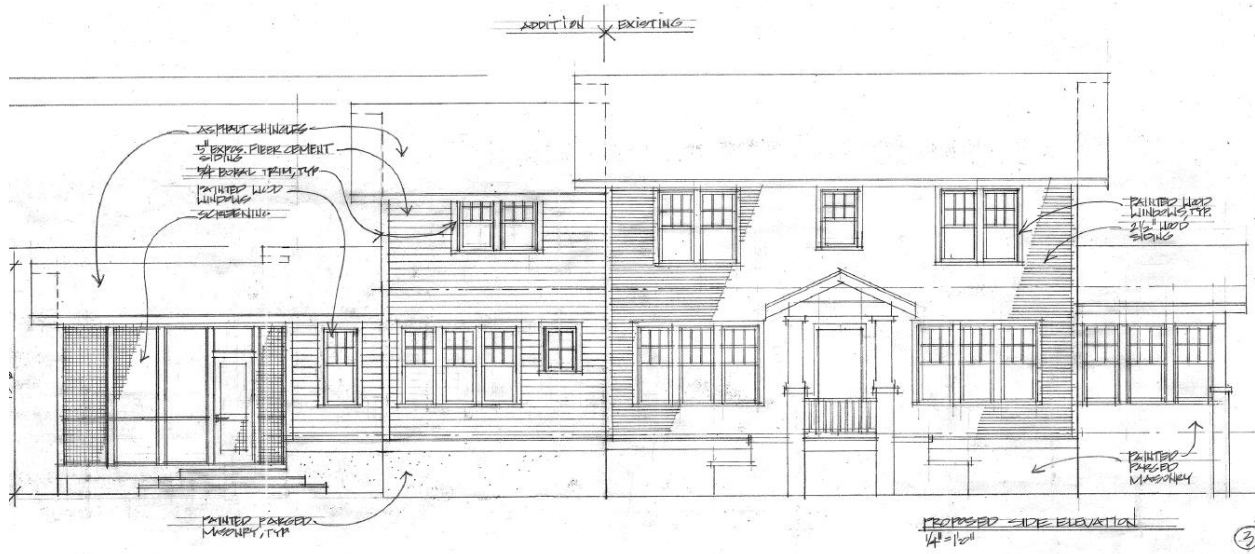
Tulip Ave. elevation of the historic house (right) and the proposed addition and porch (left).
